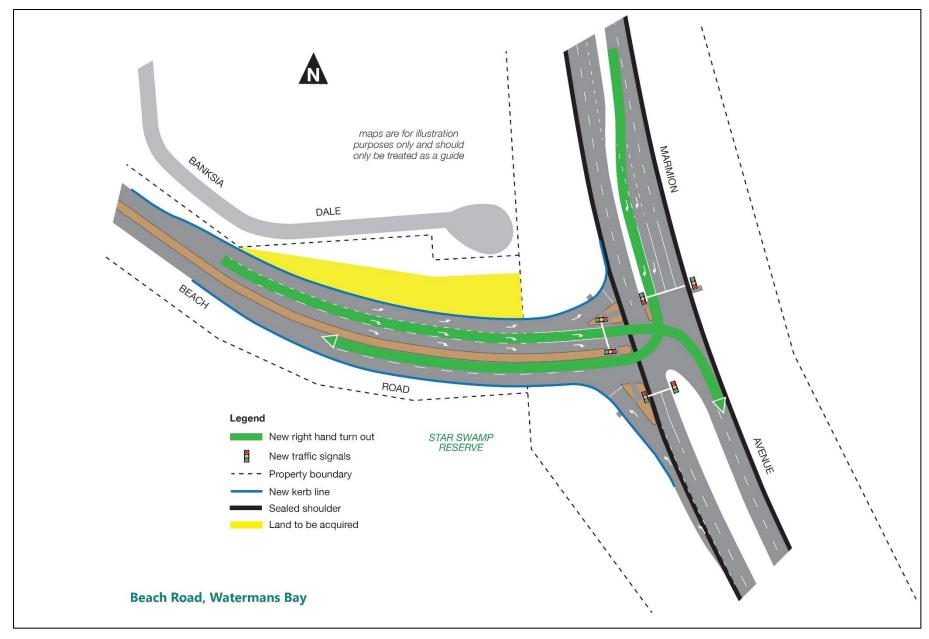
Proposed New Traffic Signals at Marmion Avenue and Beach Road West (Source: Main Roads WA)
